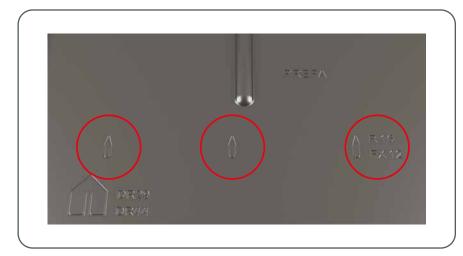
• Starter strip marking for R.16 roof tile and FX.12 roof panel
